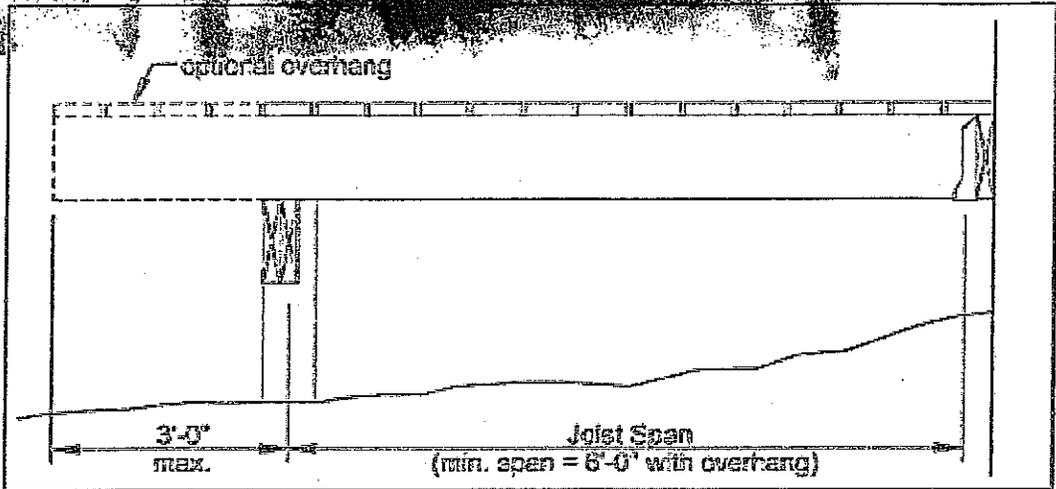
JOIST SPAN - DECK ATTACHED AT HOUSE
